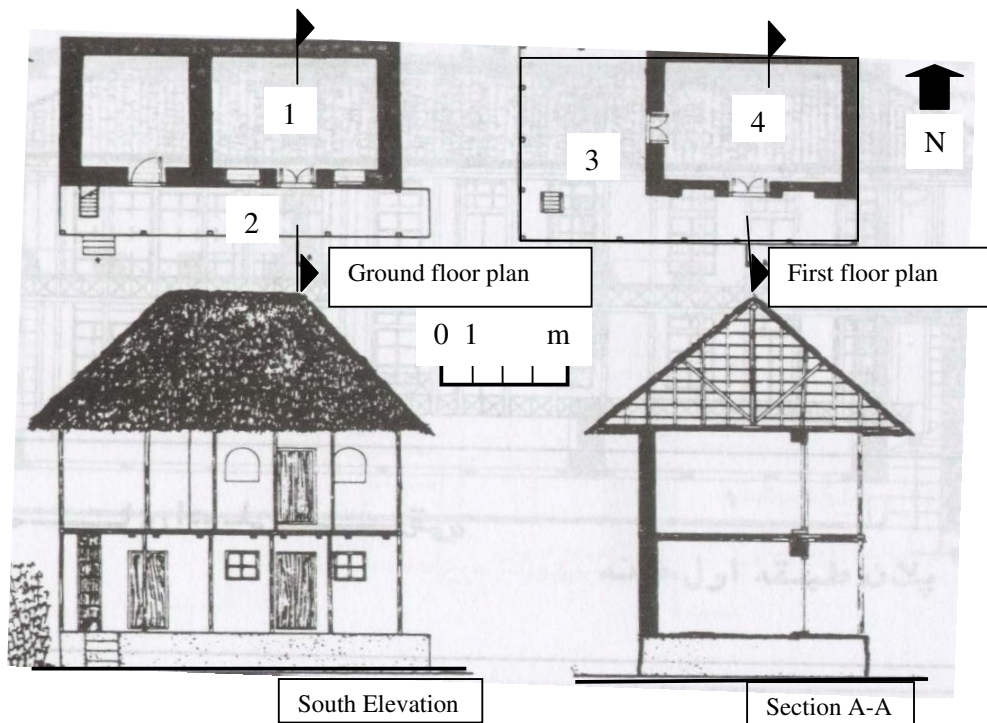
Two floors building, 1-room, 2-balcony, 3-Talar, 4-Guest room (Memarian.GH, 2006)
